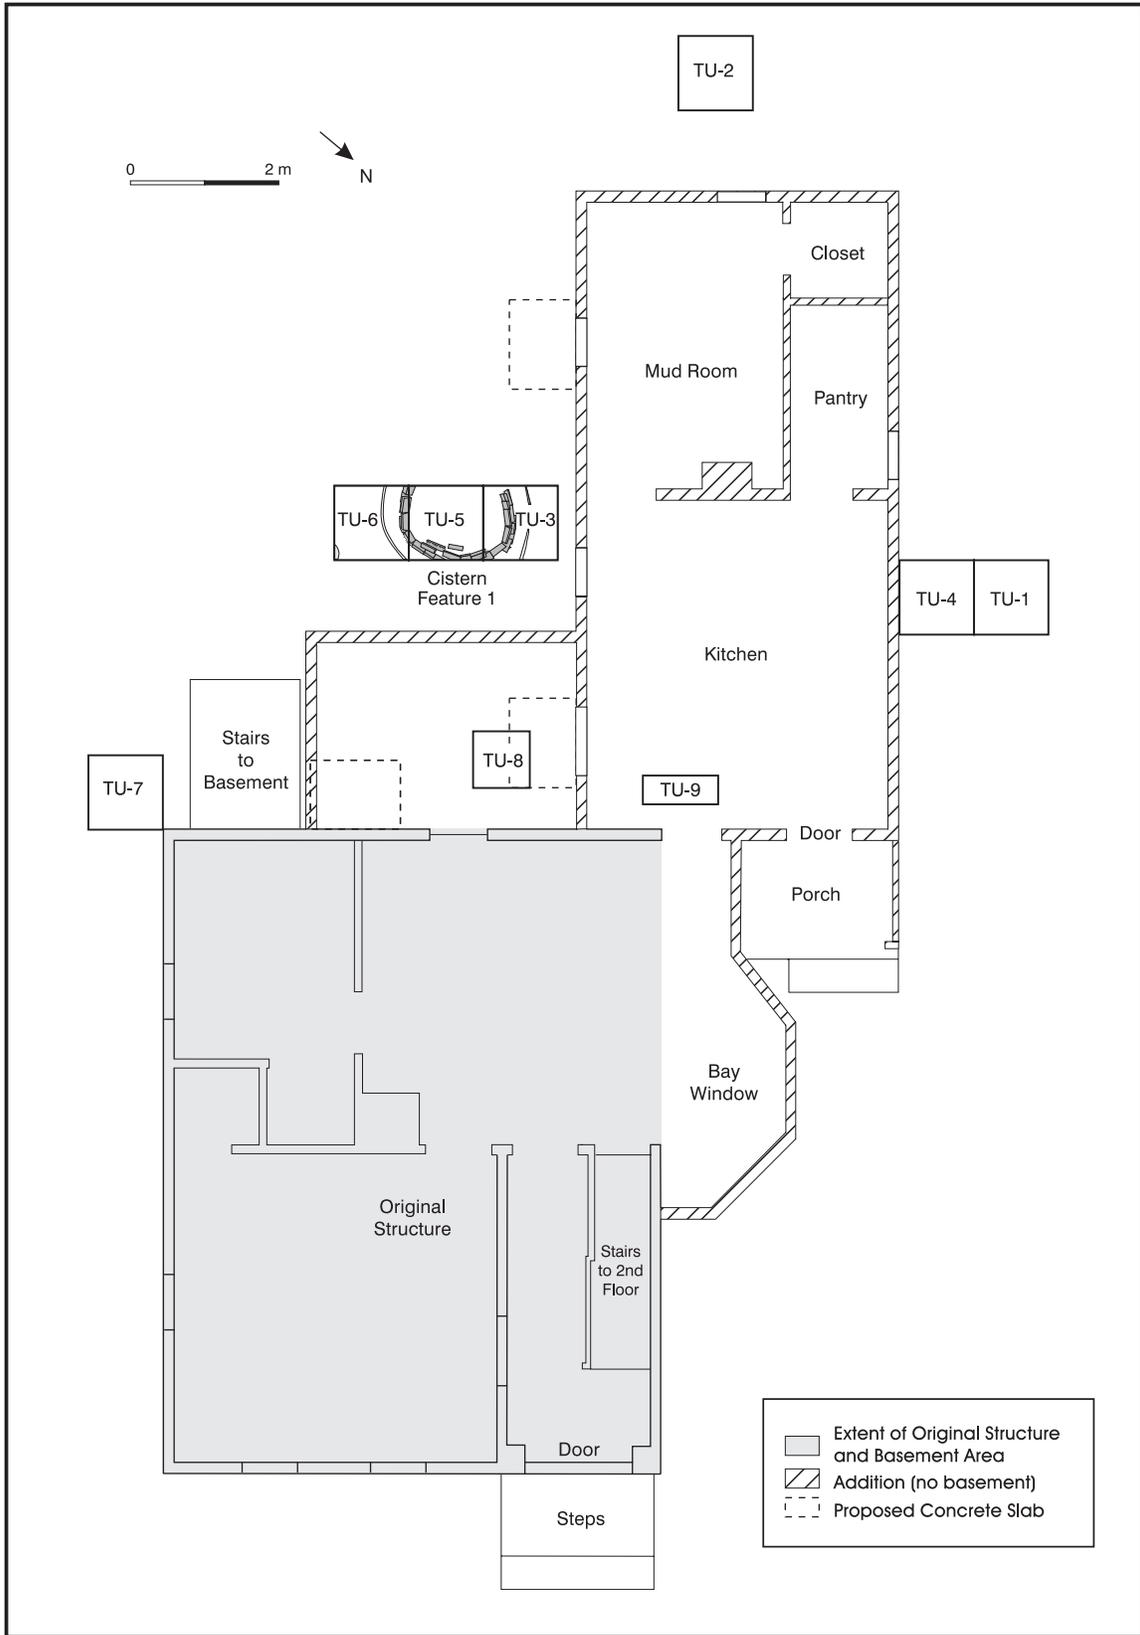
Midwest Archeological Center excavation units at the Mustill House, 1998.
